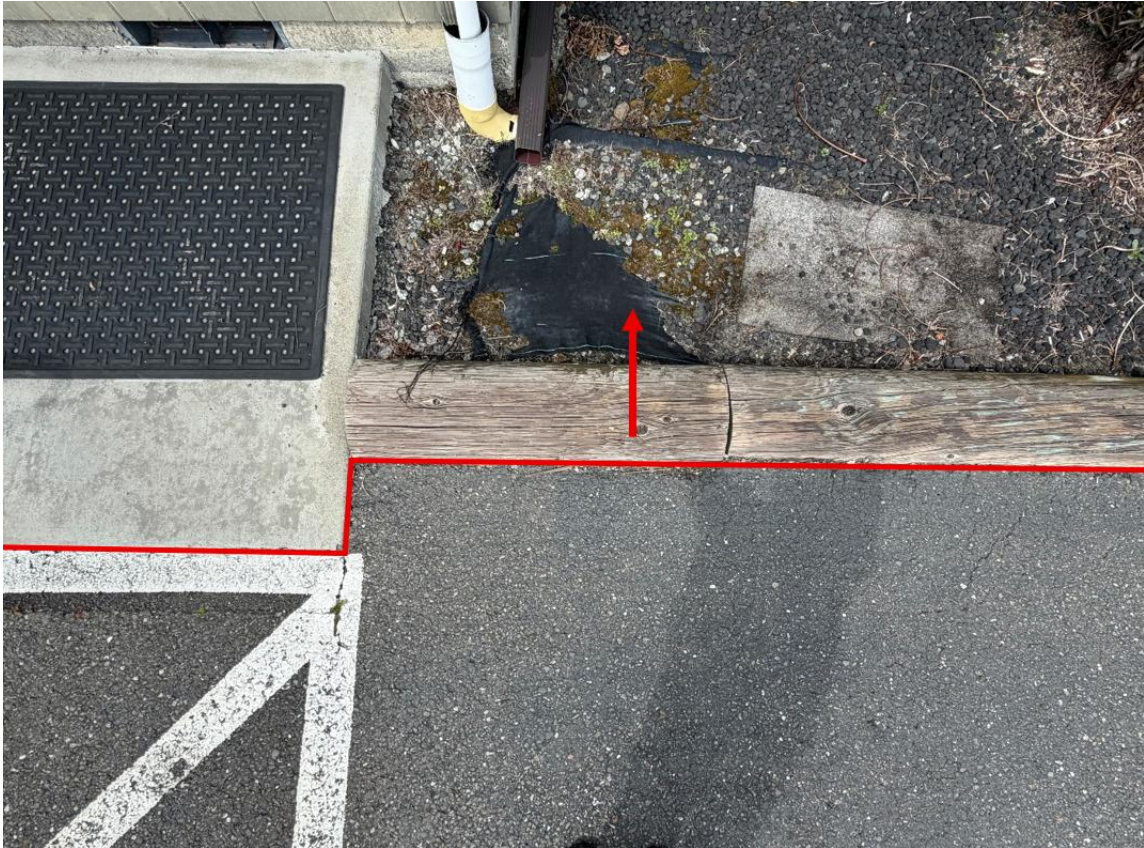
South Edge of Demolition Asphalt Detail - Asphalt and Concrete to remain south of the line
